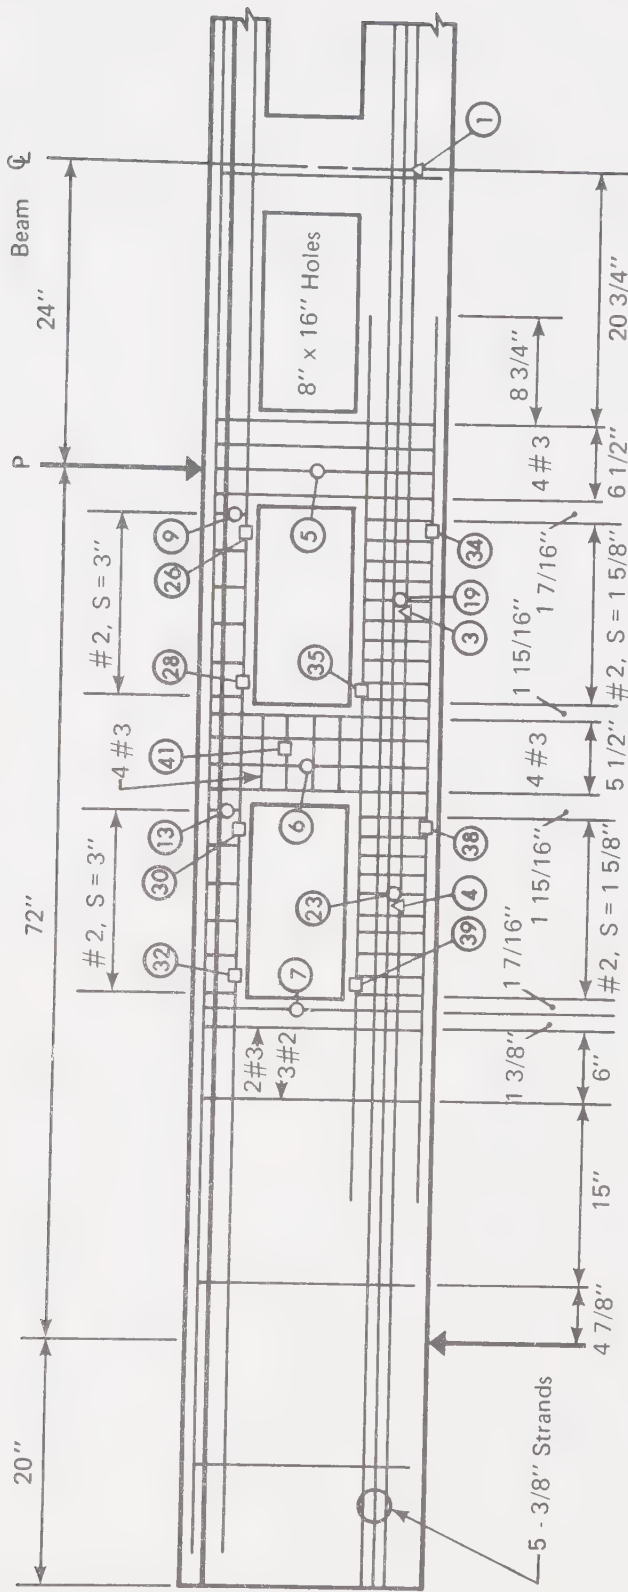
Reinforcement Details and Strain Gage Locations for Beam 25-16-6
